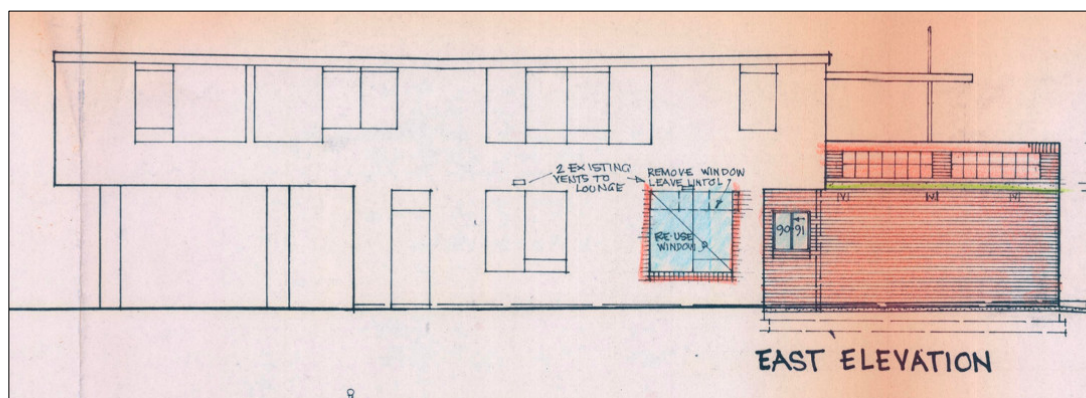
Extract from the 1975 plans showing the east elevation of the rear addition. Source: City of Stonnington
